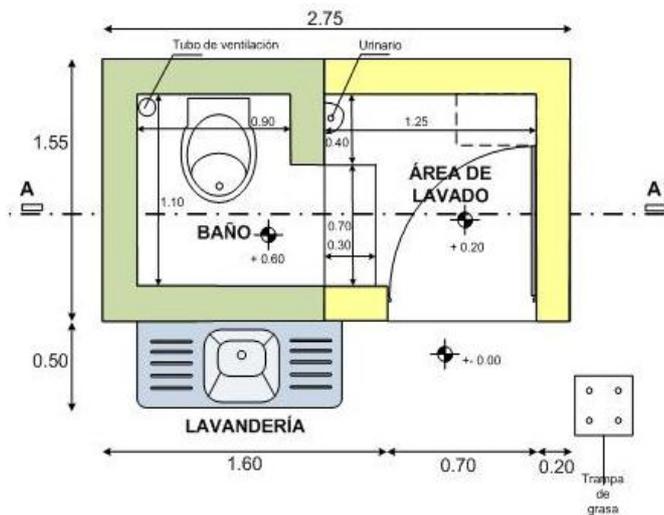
Floor plan of the single vault UDDT with shower; dimensions given in metres (Suntura, 2012).
